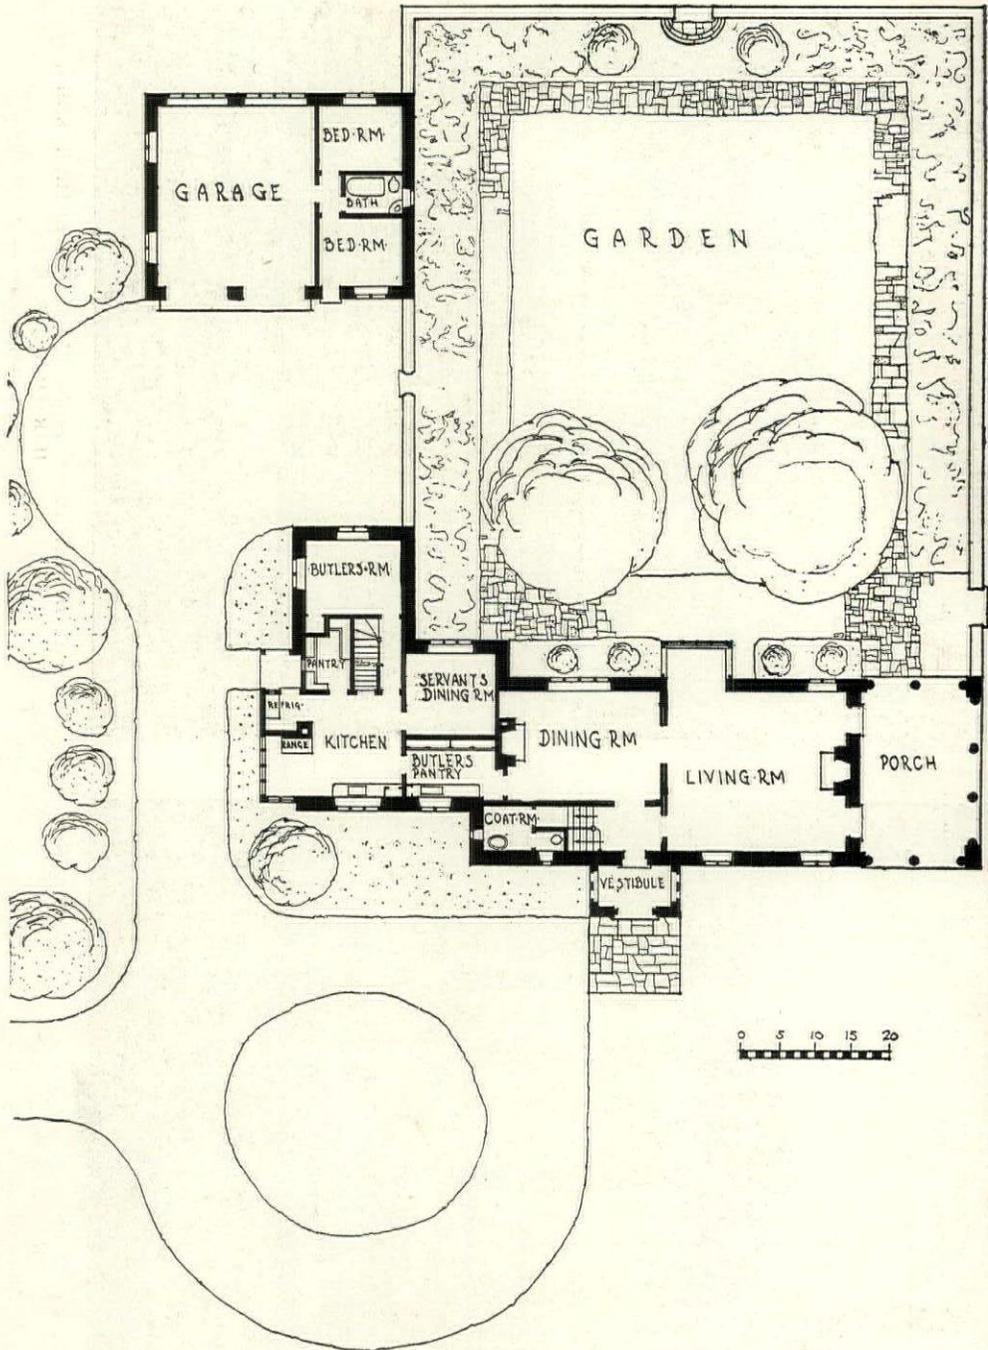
FIRST FLOOR PLAN—HOUSE OF ARTHUR KAHN, HARTSDALE, N. Y. ALFRED HOPKINS, ARCHITECT.
